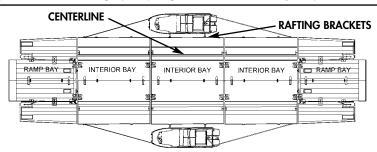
Positioning of Rafting Brackets on 5-Bay Raft Assembly.
